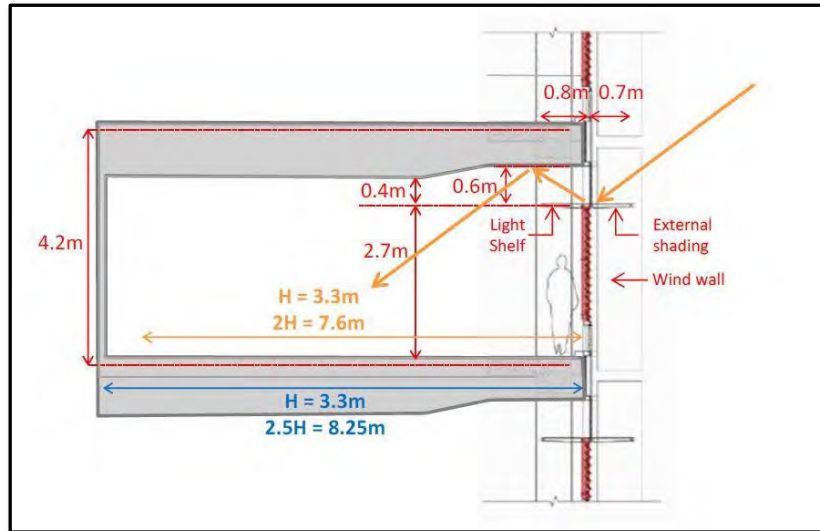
Section showing light shelf detail (Source: Yen, 2012:102)
